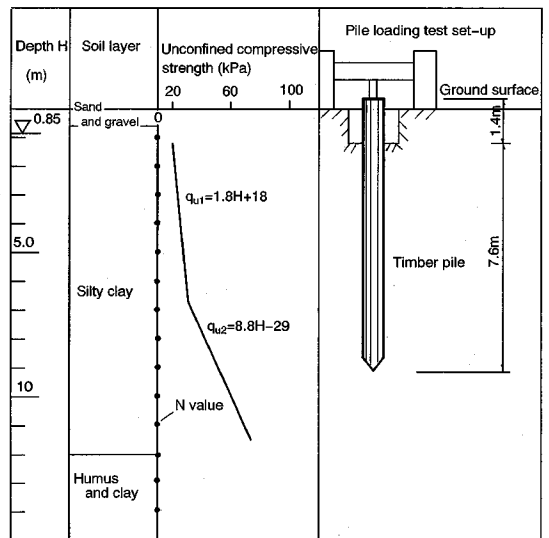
Profile of subsoil in the test site and the pile loading test set-up (test II)
